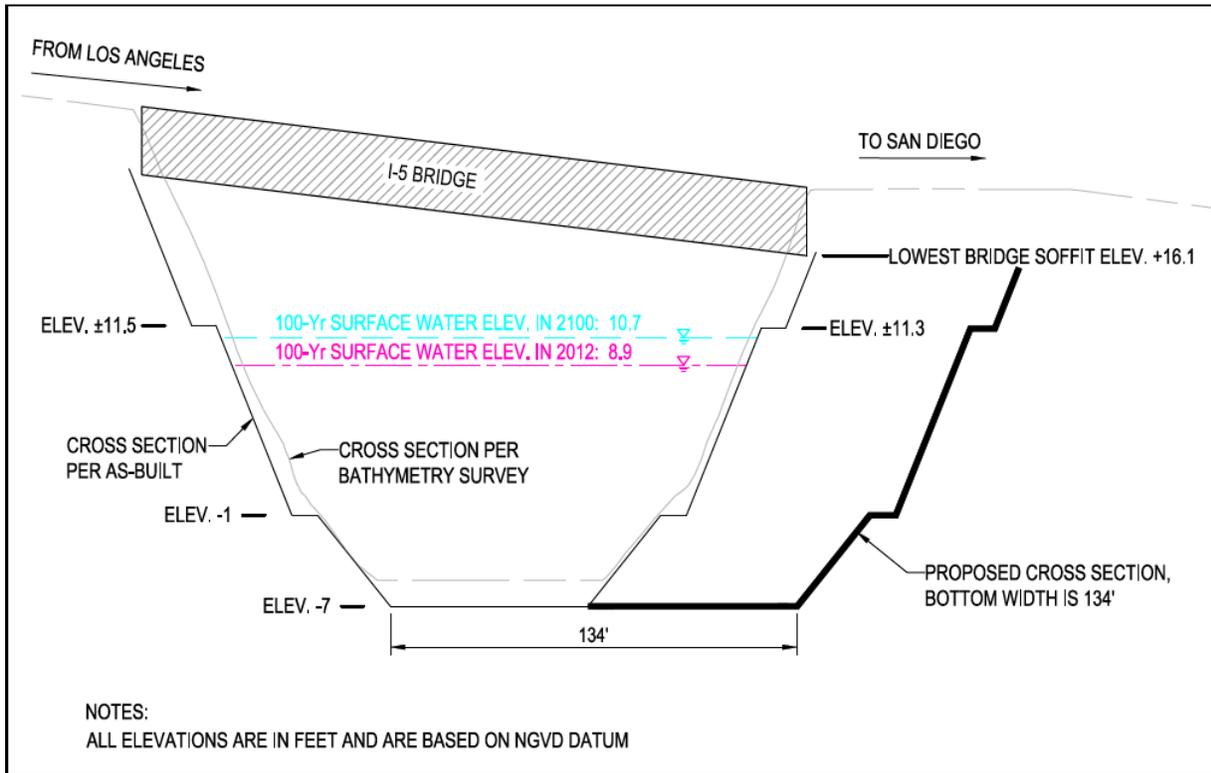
Channel Cross-Section Under I-5 Bridge
